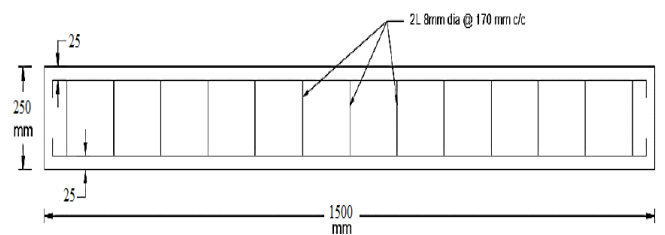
Geometry Reinforcement Arrangement of Test Beam Specimens
